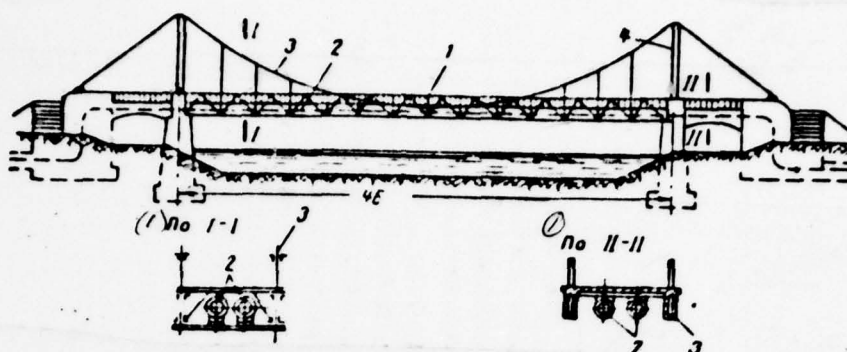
Suspended foot bridge for thermoficated main line. 1 - farm/truss of rigidity; 2 - pipeline; 3 - steel cable; 4 - pylon.
